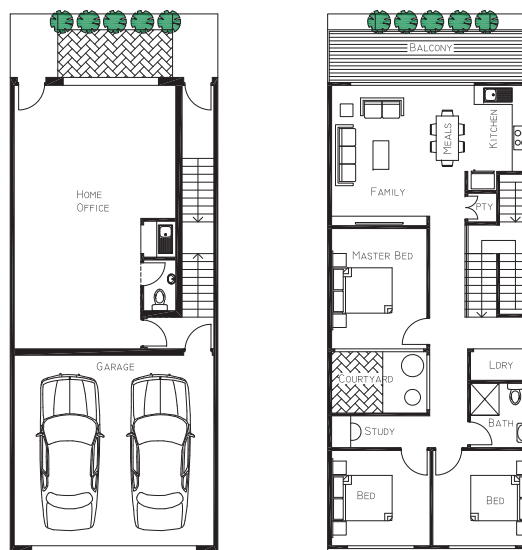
Indicative Floor Plan of SoHo [with garage]
